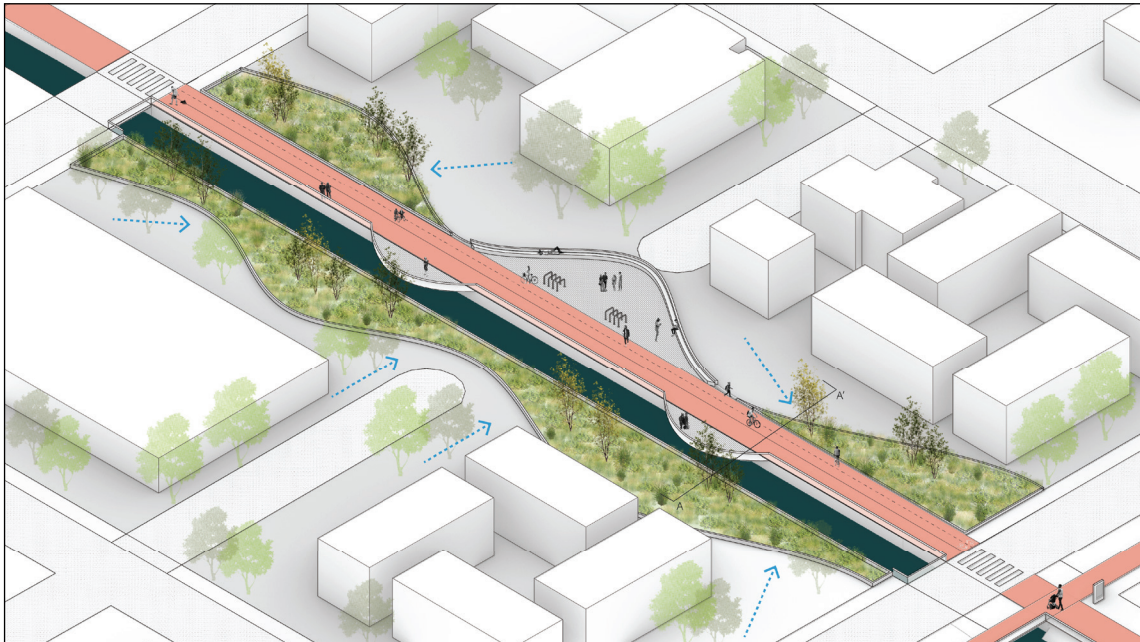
Axon of trail connection with Mixed-Use buildings adjacent
